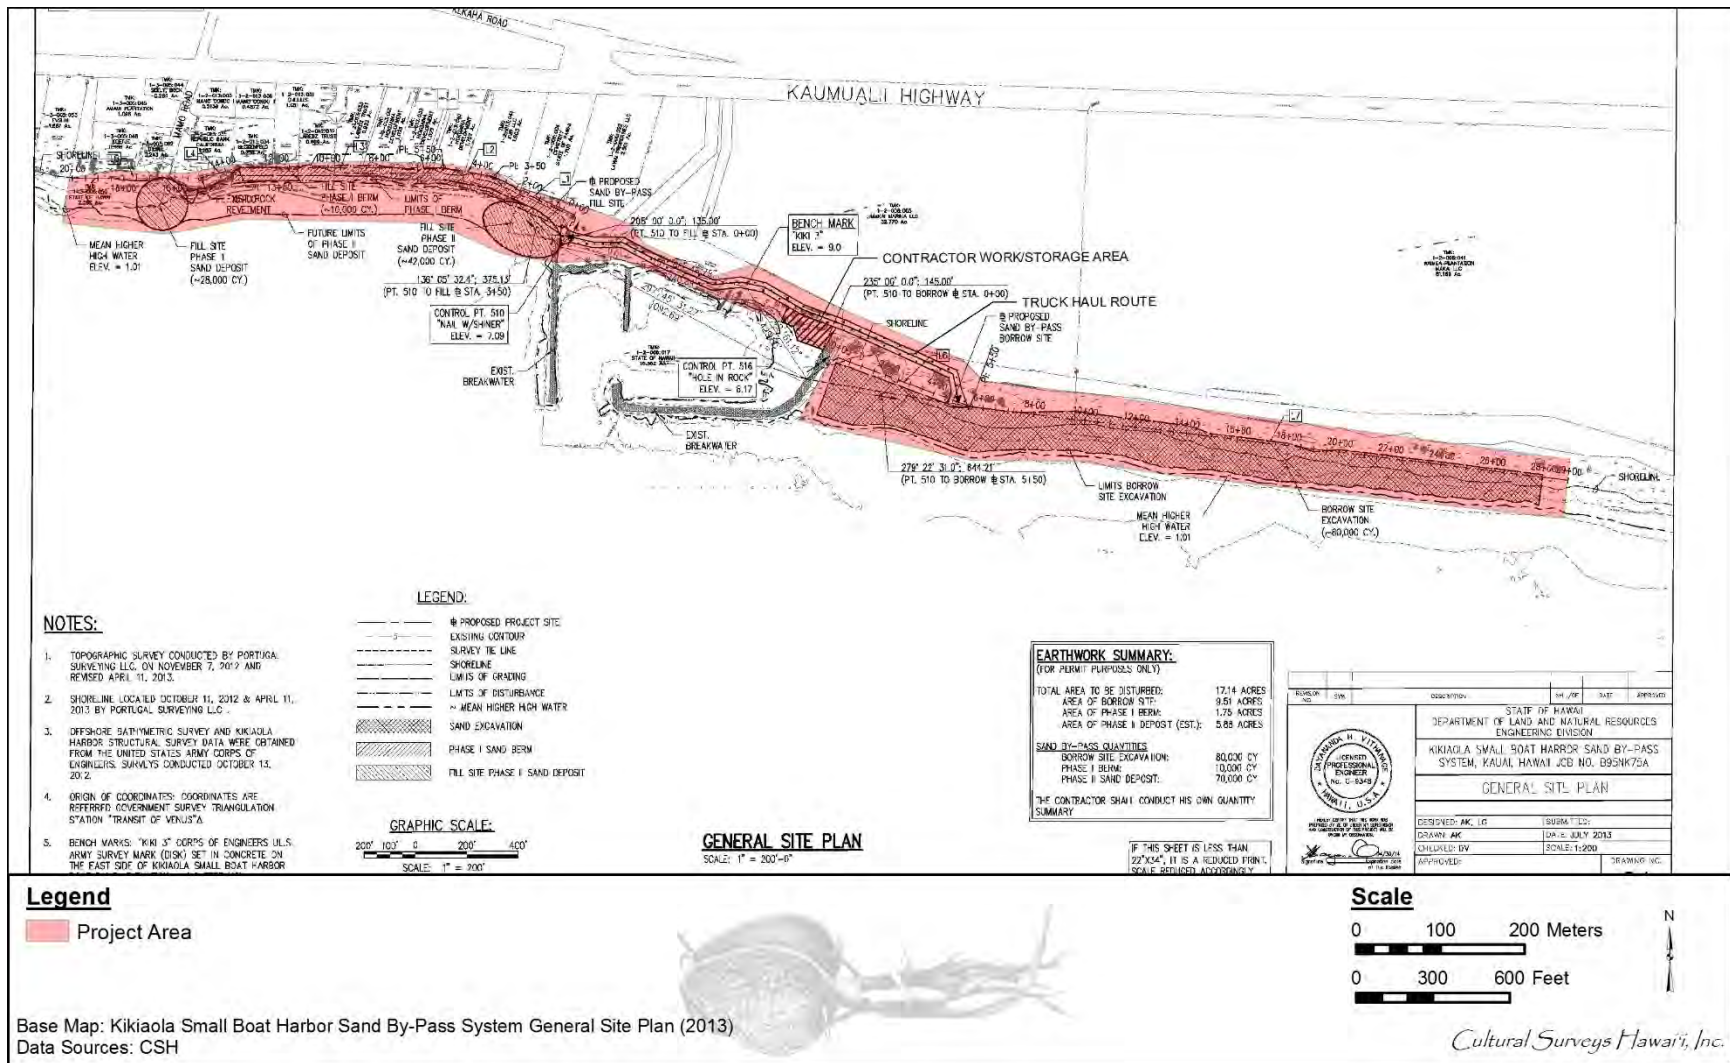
Client-provided general site plan showing construction access route and proposed contractor work/storage area
